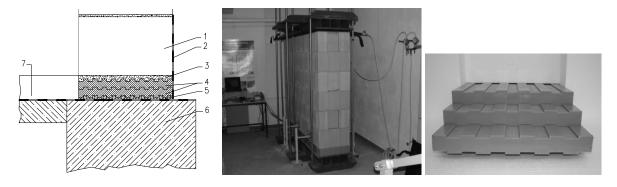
Insulation block - section (a) and insulation block in the testing stand (b), detail of an insulation block composite by 3 boards (c)
